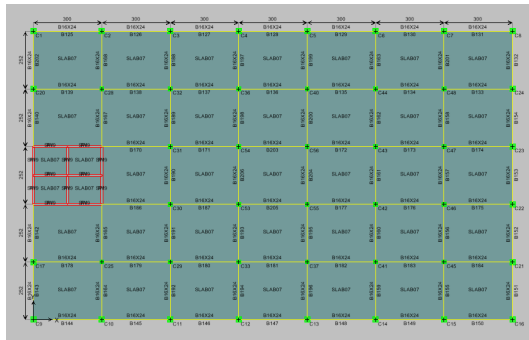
Plan of building (Shear wall displaced 75 ft. in x direction)
